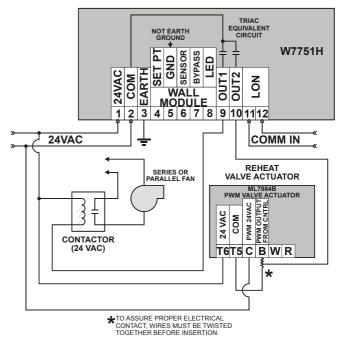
W7751H to PWM Valve Actuator and series or parallel fan
